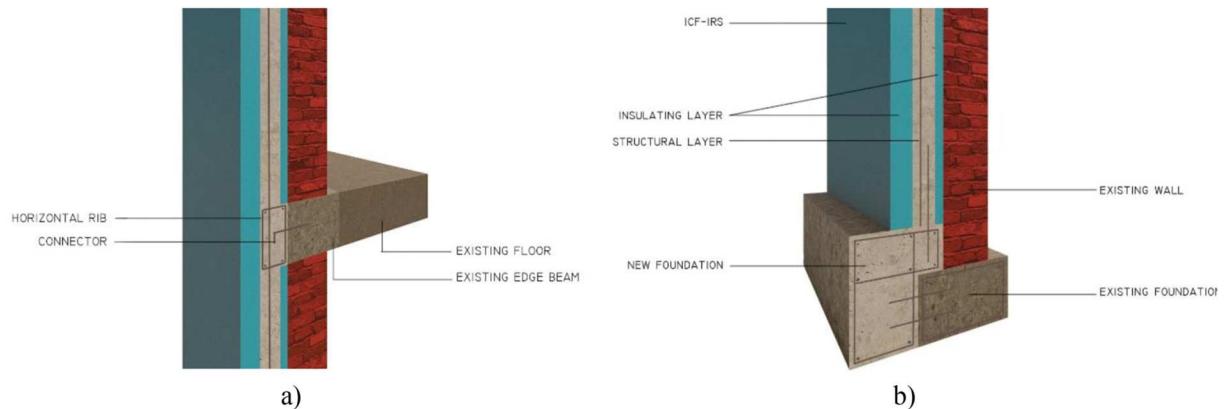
Insulating concrete formworks: a) Connection of the system to storey beams and b) foundations based on (based on [48]).
